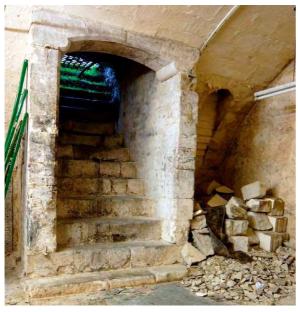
Staircase to street at the undercroft below the town hall, High Street.
